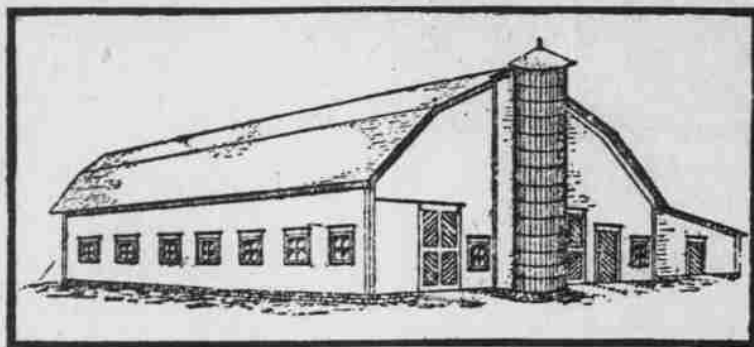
DETAILED PLAN FOR PRACTICAL FARM BUILDING
